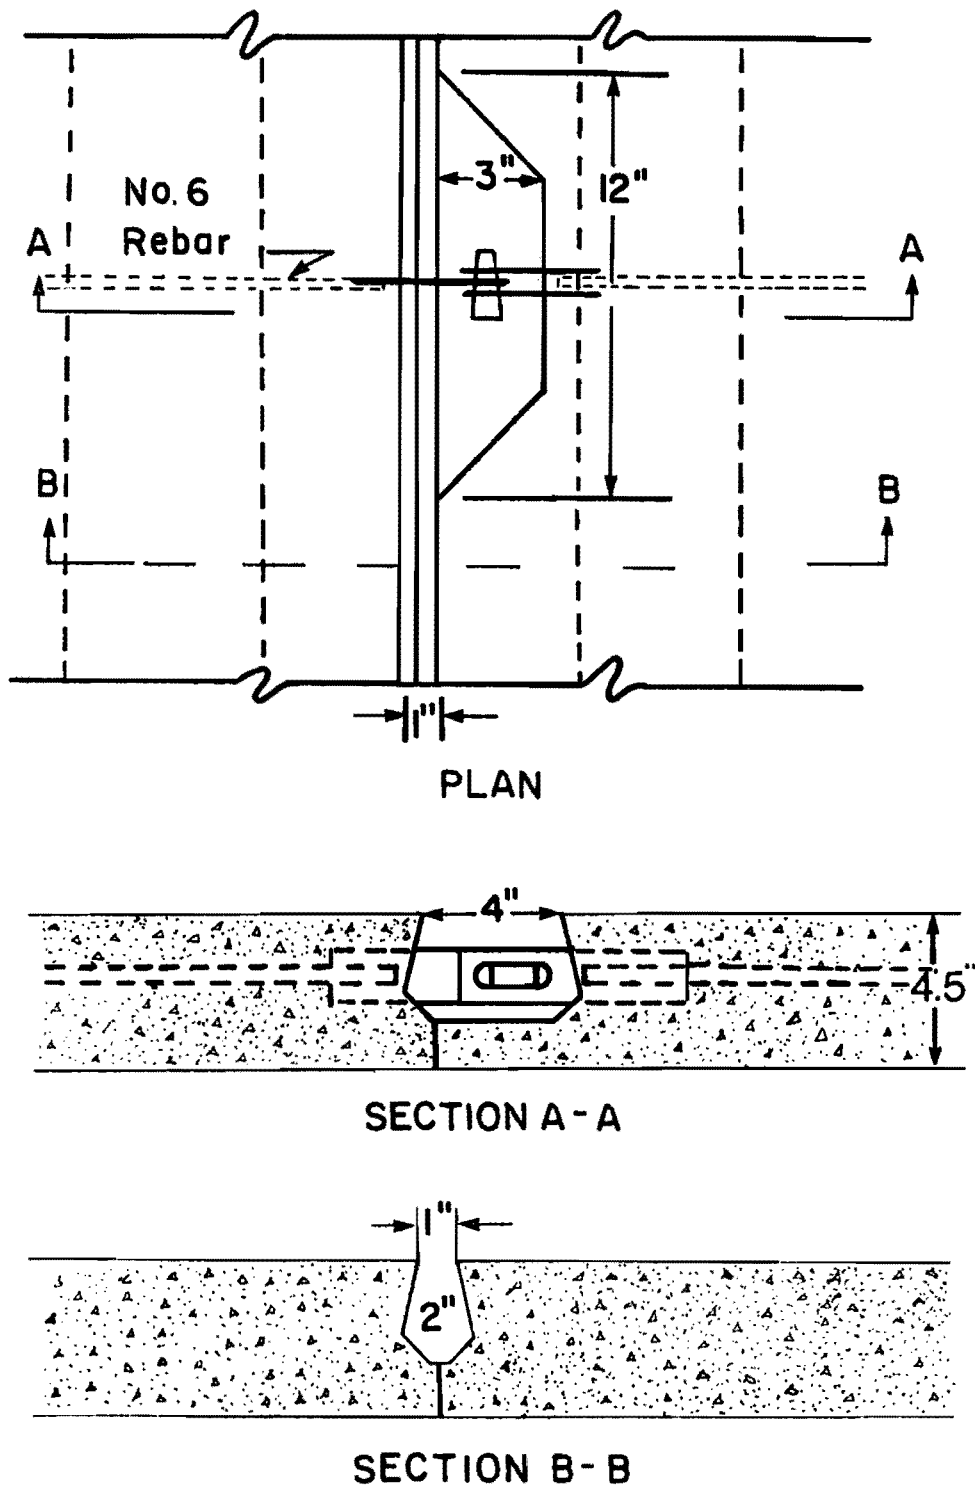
Details for tongue-and-fork connection and grout key (Ref 57).
